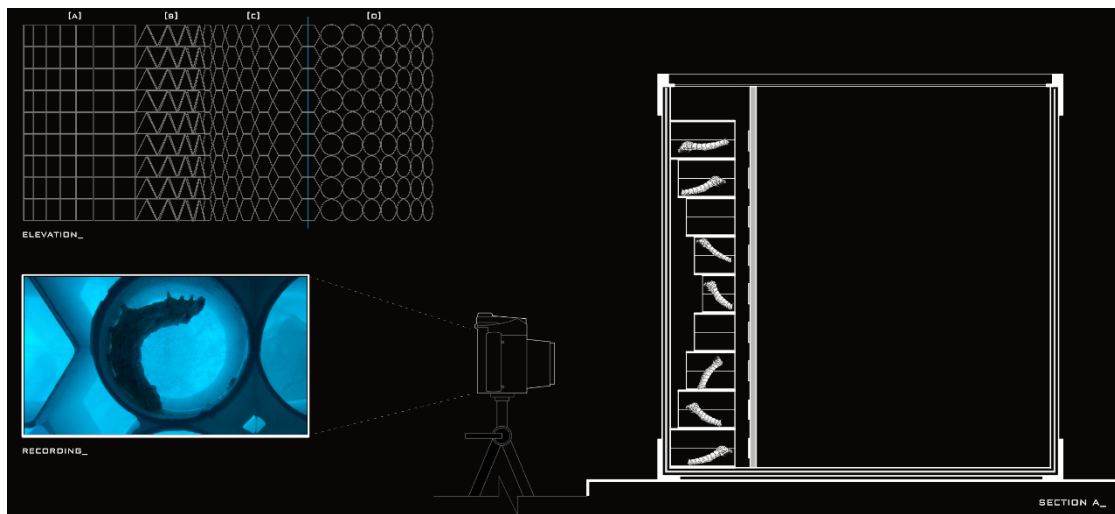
Section and elevation drawings of the Cocooning Cells layout.
